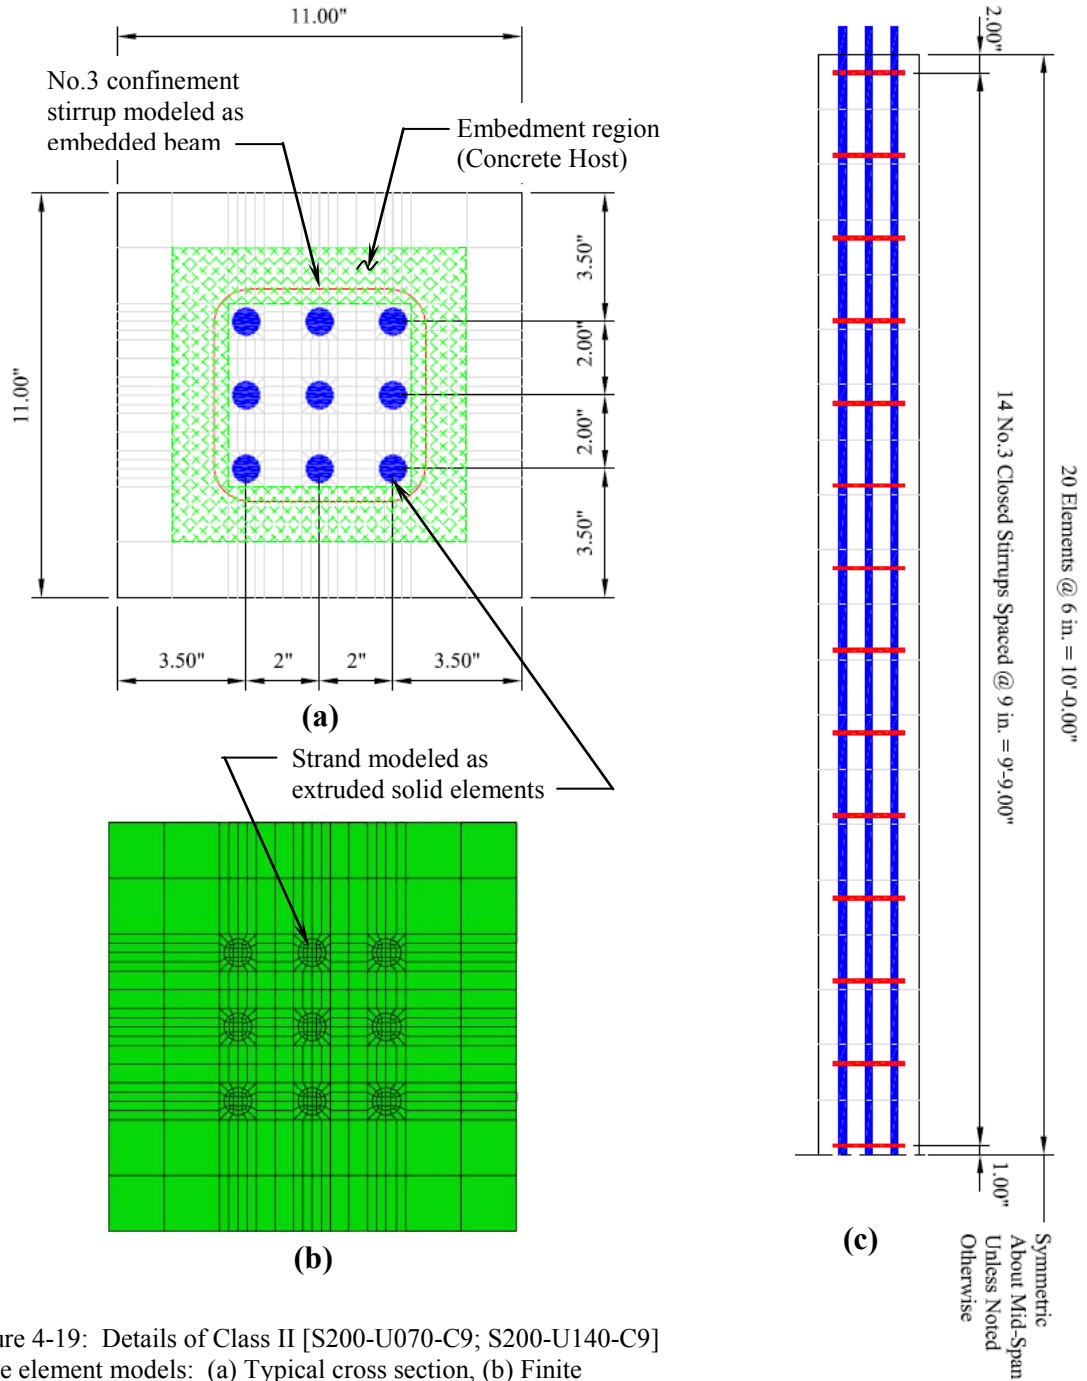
Details of Class II [S200-U070-C9; S200-U140-C9] finite element models: (a) Typical cross section, (b) Finite element simulation, and (c) Layout of confinement reinforcement (No.3 closed stirrups spaced at 9 in. on center)
